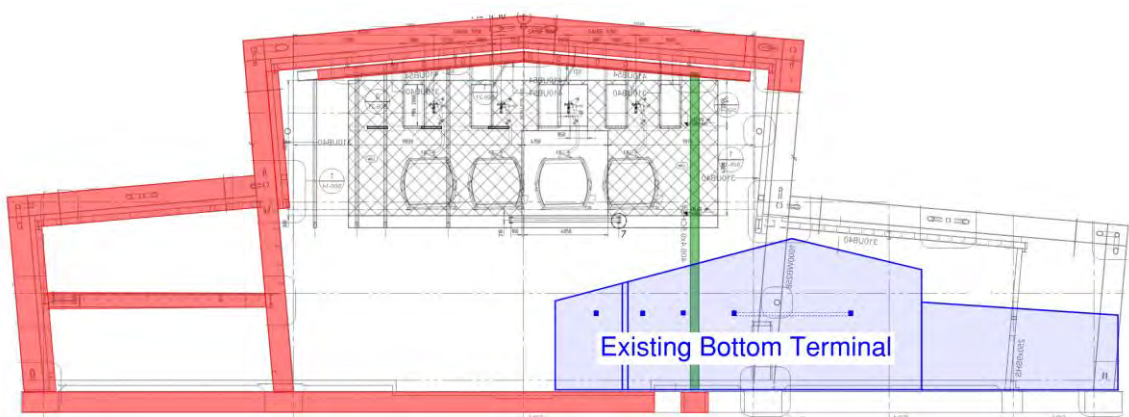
Cross section through the Bottom Terminal showing the scale of the new building
